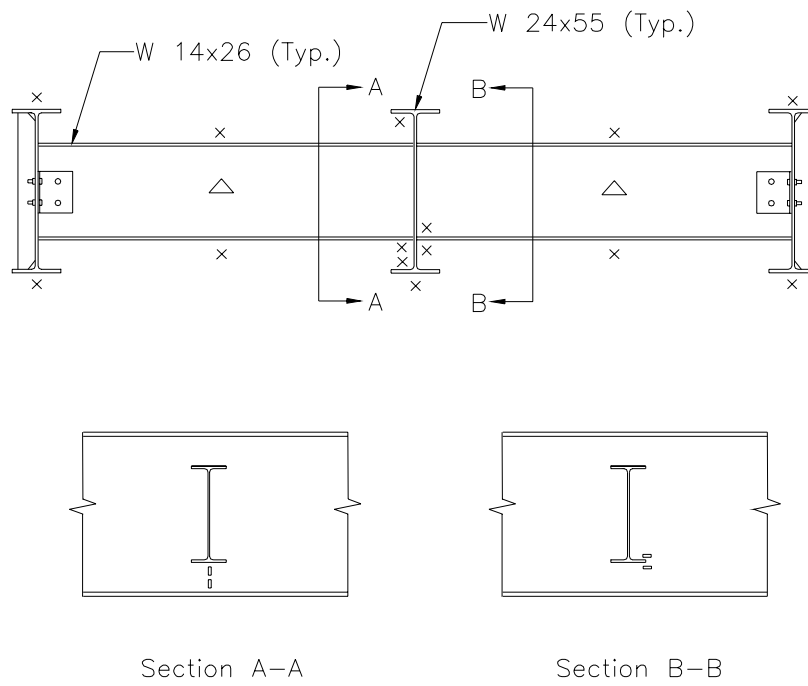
First step in weld procedure: mark the weld placement
